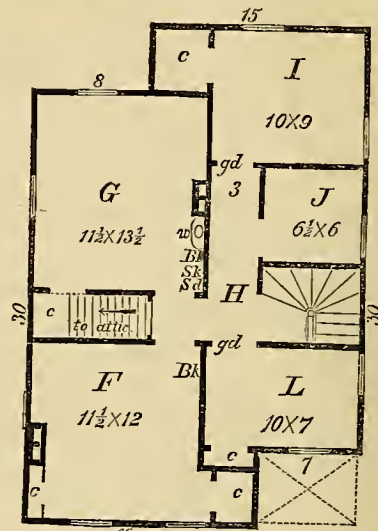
SECOND STORY.—FLOOR PLAN.
